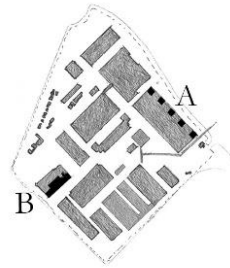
Individual building features considered as heritage items but demolished on Strijp-R due to technical feasibility. A – Ventilation shafts of RO building. B - Garage doors of RF building
